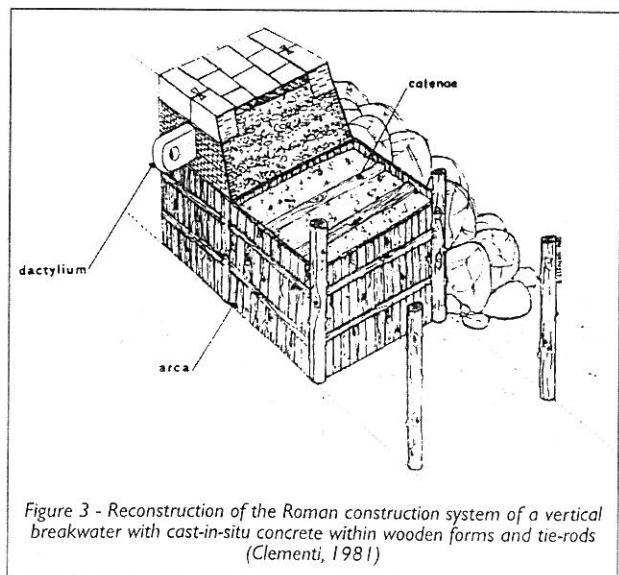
Reconstruction of the Roman construction system of a vertical breakwater with cast-in-situ concrete within wooden forms and tie-rods (Clementi, 1981)
